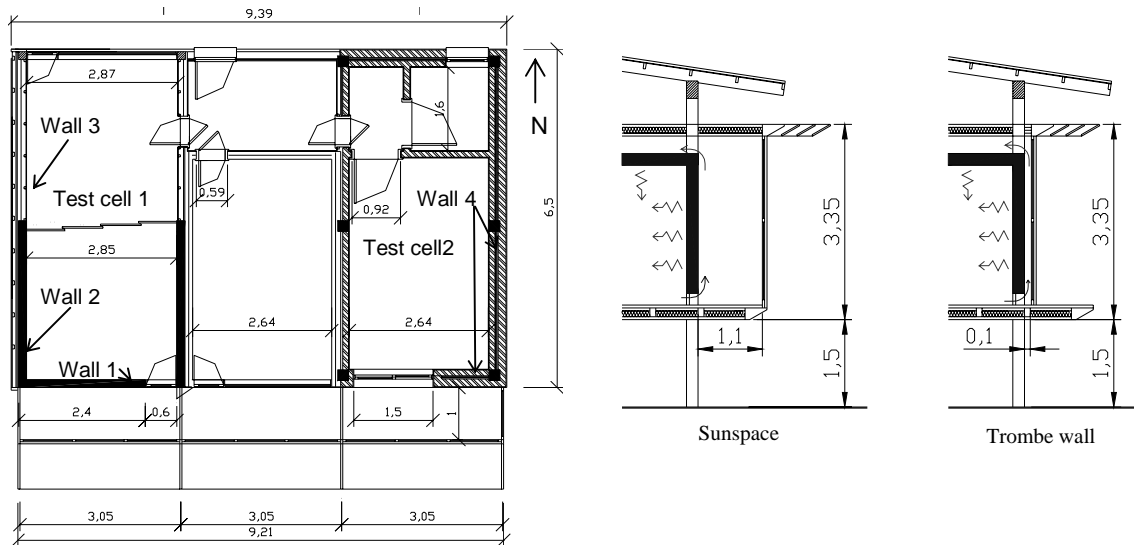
Test cells' plan and schematic vertical section of moving window (through wall 1) to create a Sunspace or a Trombe wall (distances in m).
